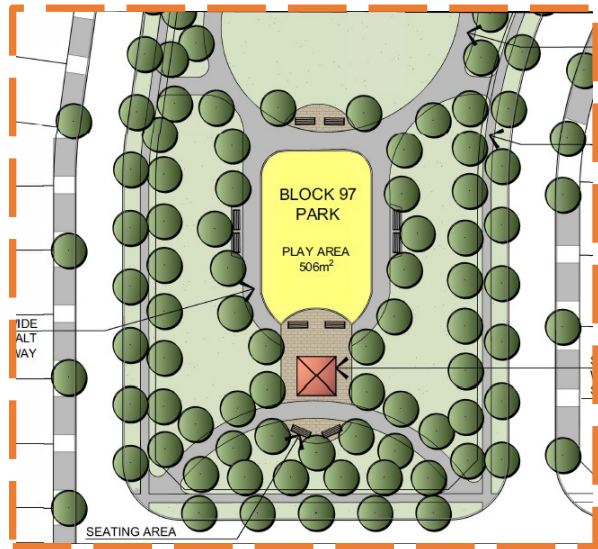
Related Draft Plan of Subdivision Application (19T-220V13) – Edenbrook (Weston) Inc.
